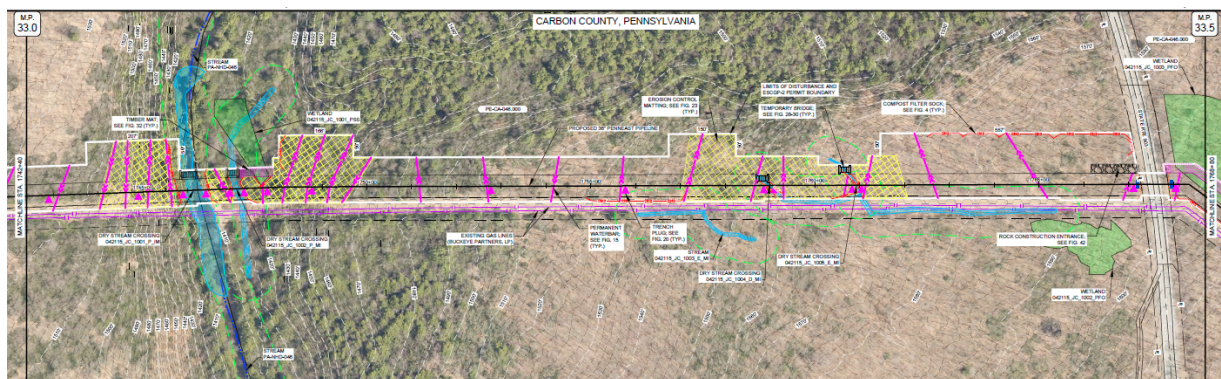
Erosion and Sediment Control Plan Alignment Sheet 67 MP 33.0 to MP 33.5
